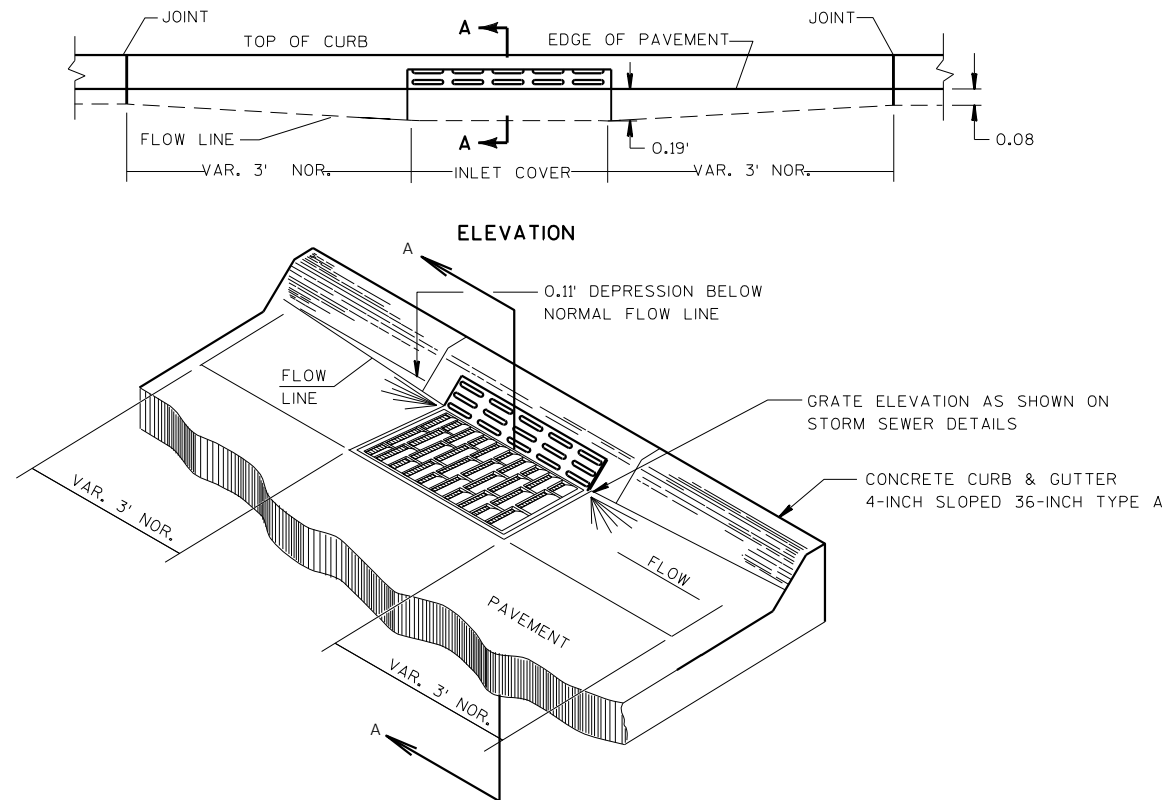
DETAIL OF CONCRETE CURB & GUTTER 36-INCH TYPE R AT INLETS
